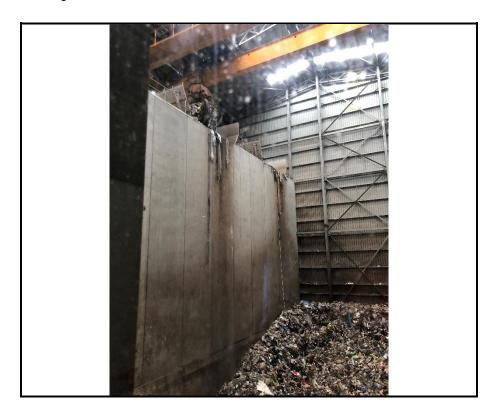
Inside the Reception building within the eastern portion of the site, looking towards the north.
